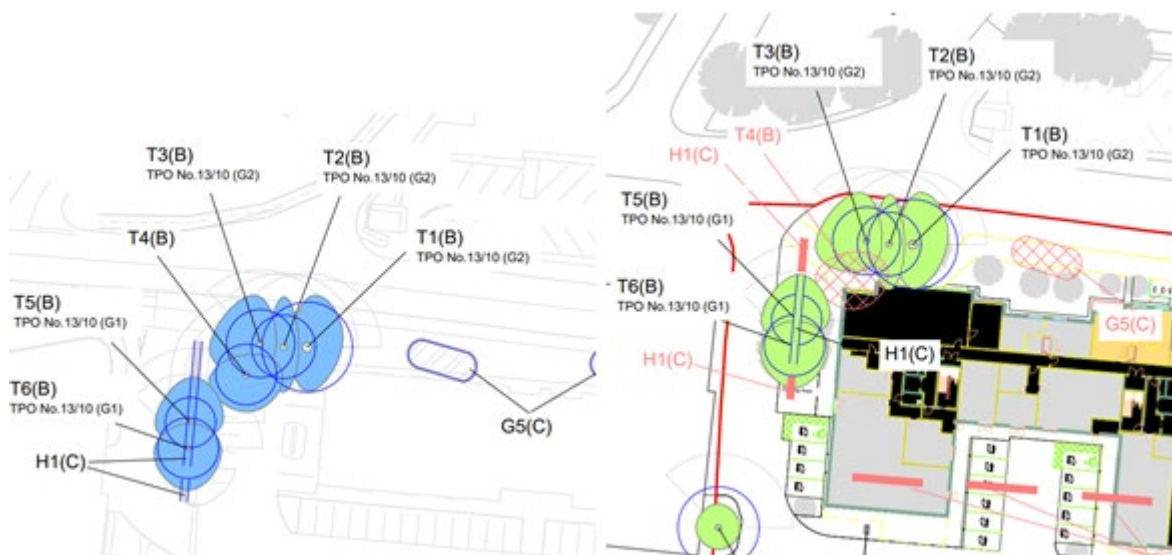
Existing (left) and proposed (layout) in relation to TPO trees
